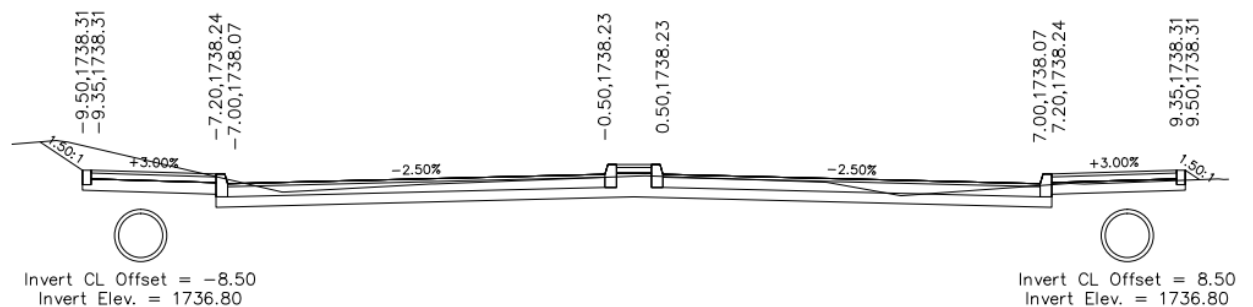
Cross Section for Seka Ber - Total - Tilahun Shell
